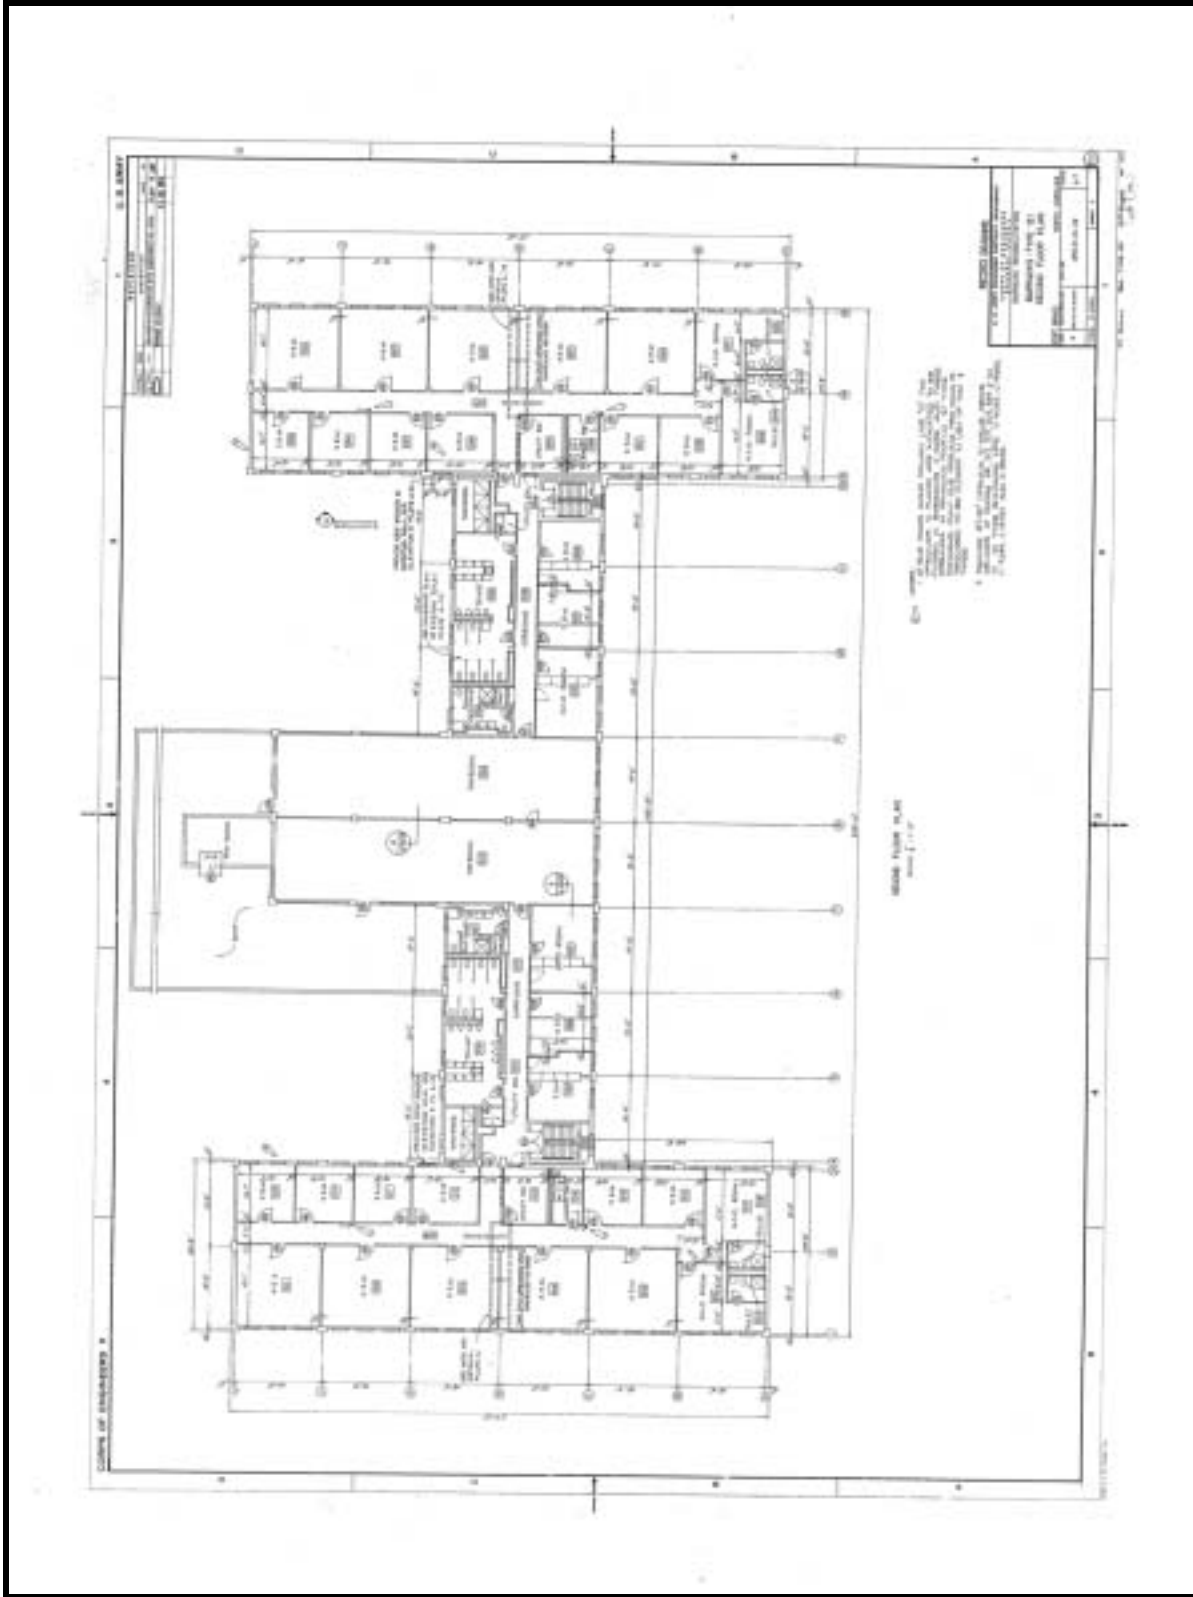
Renovated H- style, two-company barracks, barracks wing, second floor plan, Ft. Bragg (1972, revised 1974) (Engineering, Ft. Bragg).
